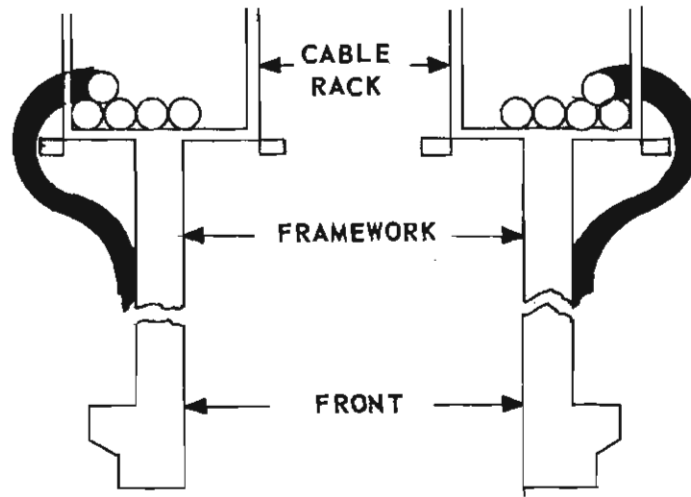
END VIEW OF FRONT AISLE SHOWING POSITION OF OVER FRAME CABLE RACK
